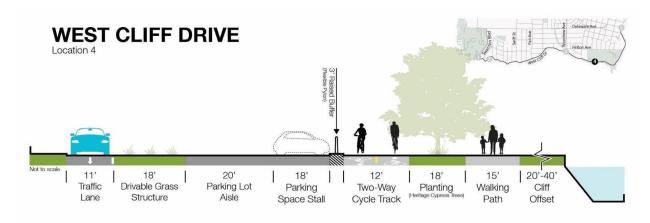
Alternative 2 Concept- Cross Section of State Parks Parking Lot A
